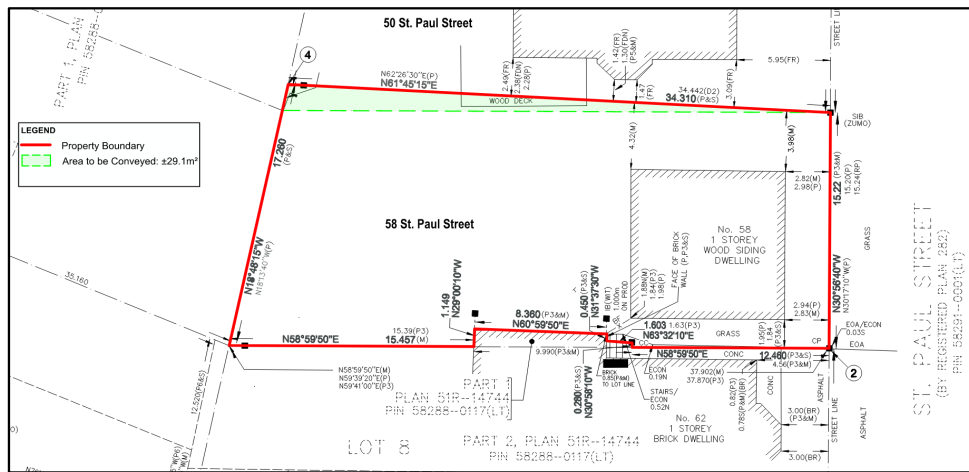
Sketch plan of the Consent. Lands in green approved to be conveyed to 50 Saint Paul Street. Source: MHBC Planning
